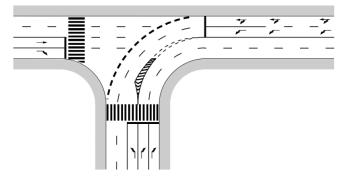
Road markings and lanes on the roads. (ROAD TECHNICAL SPECIFICATIONS E-UT2-1.113-2001-DESIGN OF ROAD MARKINGS)
